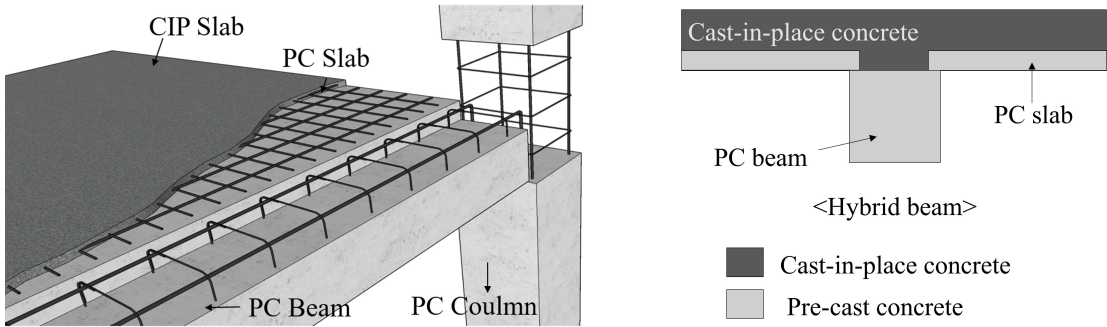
Composite method of precast concrete and cast-in-plcae concrete
